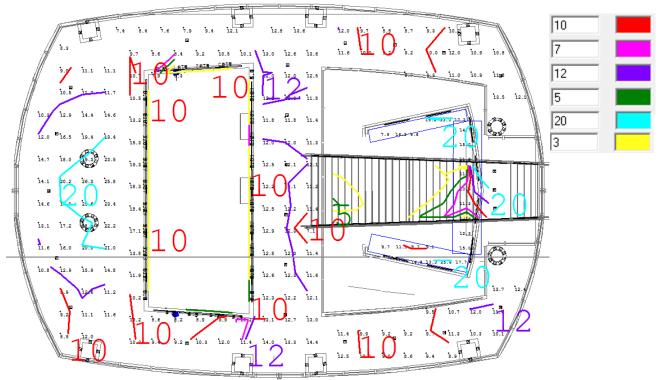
Lobby Floor Plan Isometric Contour Lines
